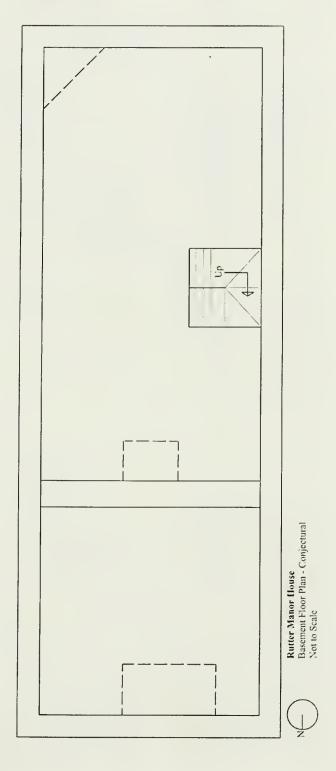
Conjectural Basement Floor Plan for Center Section of Main House
